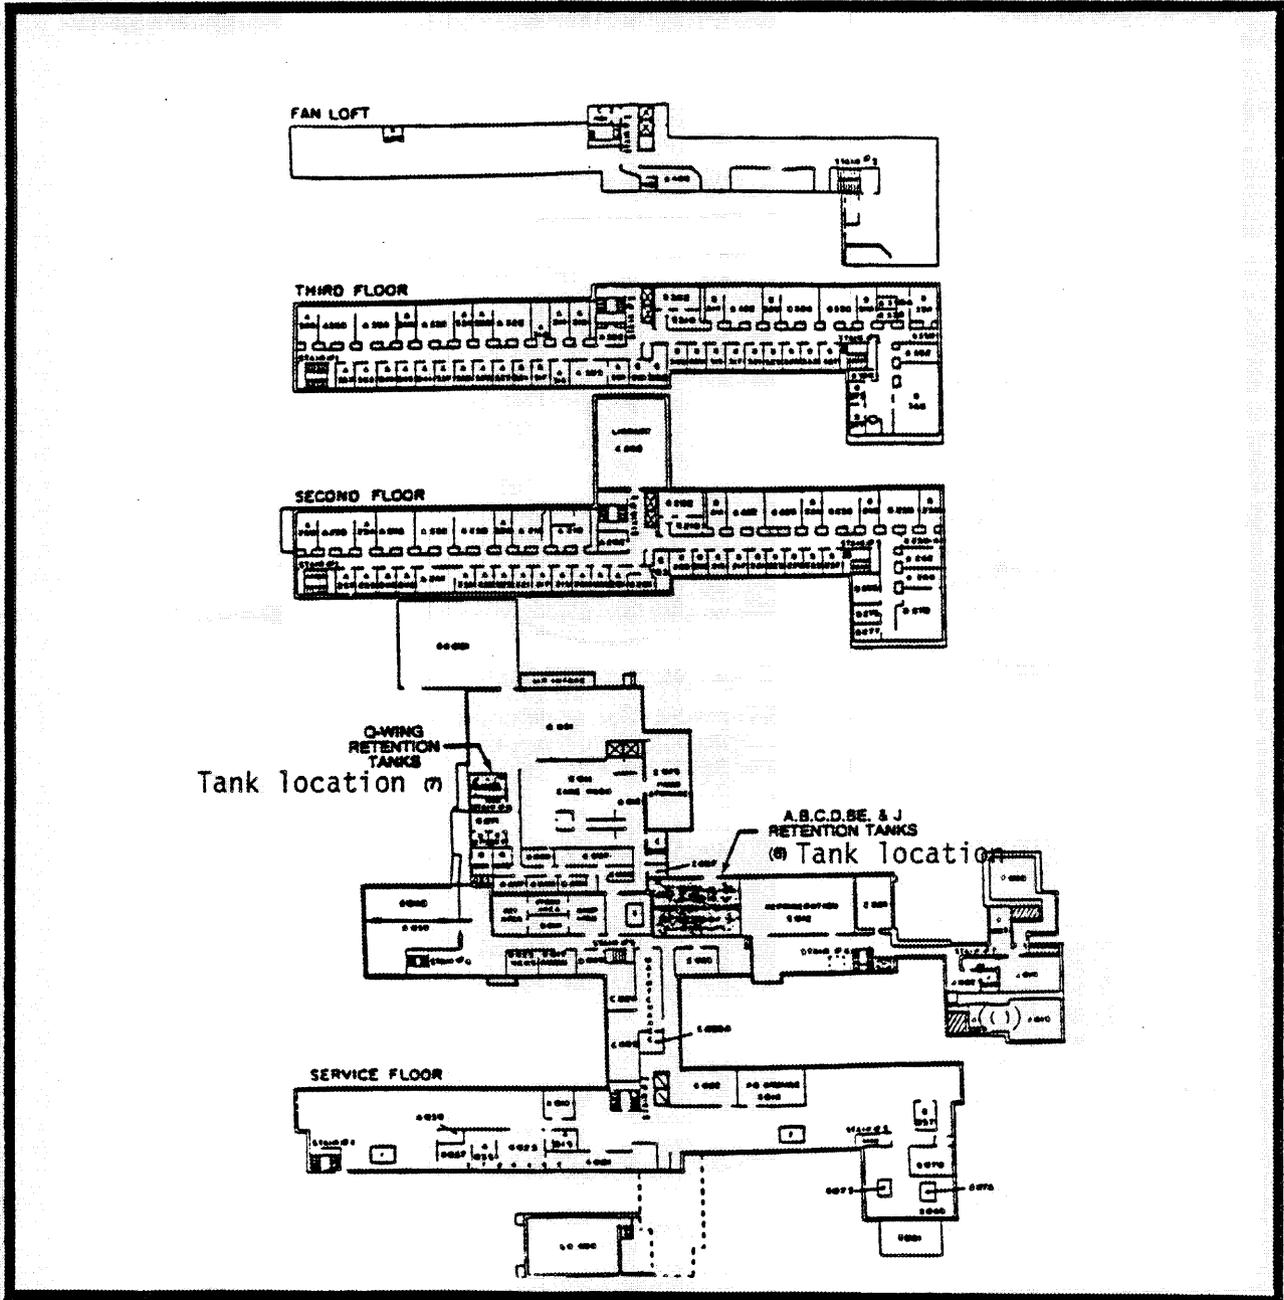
Waste Retention Tanks in Building 202: Service Floor
